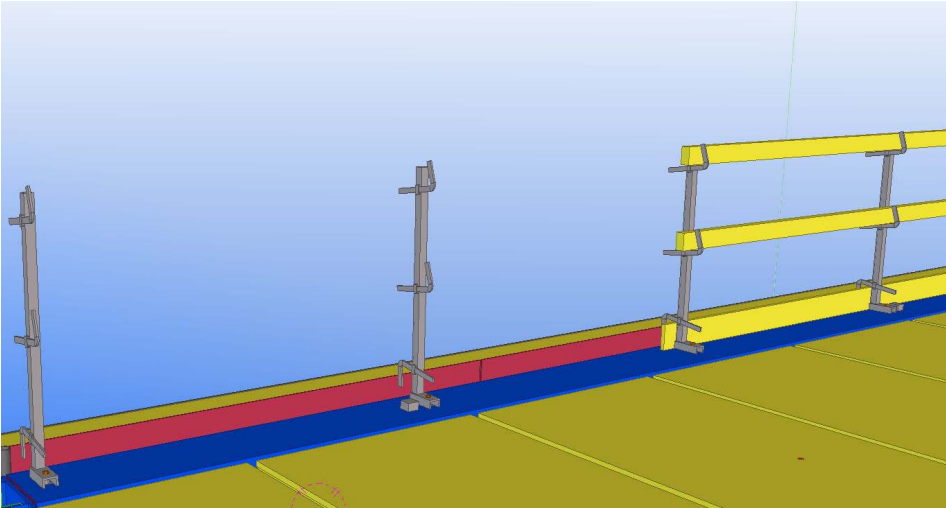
The same safety railing solution modelled into an overground floor: guardrail posts installed to fixings in the prefabricated steel beams.
